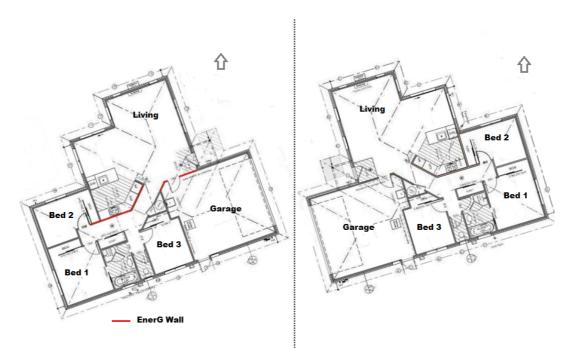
Rangiora house plans (left EnerG Wall, right Eco Sure)
